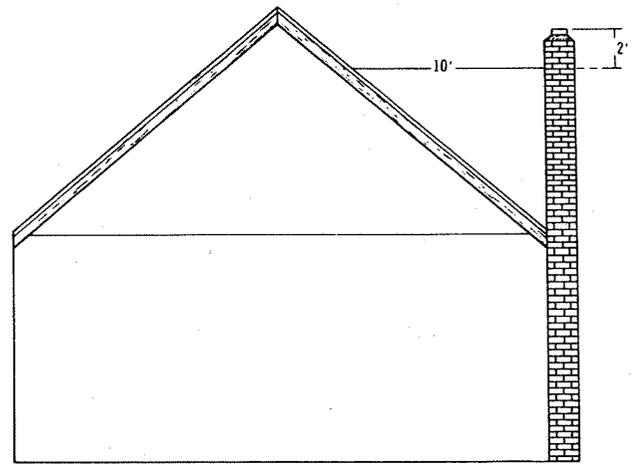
Chimney height in relation to 10-foot distance from roof.
